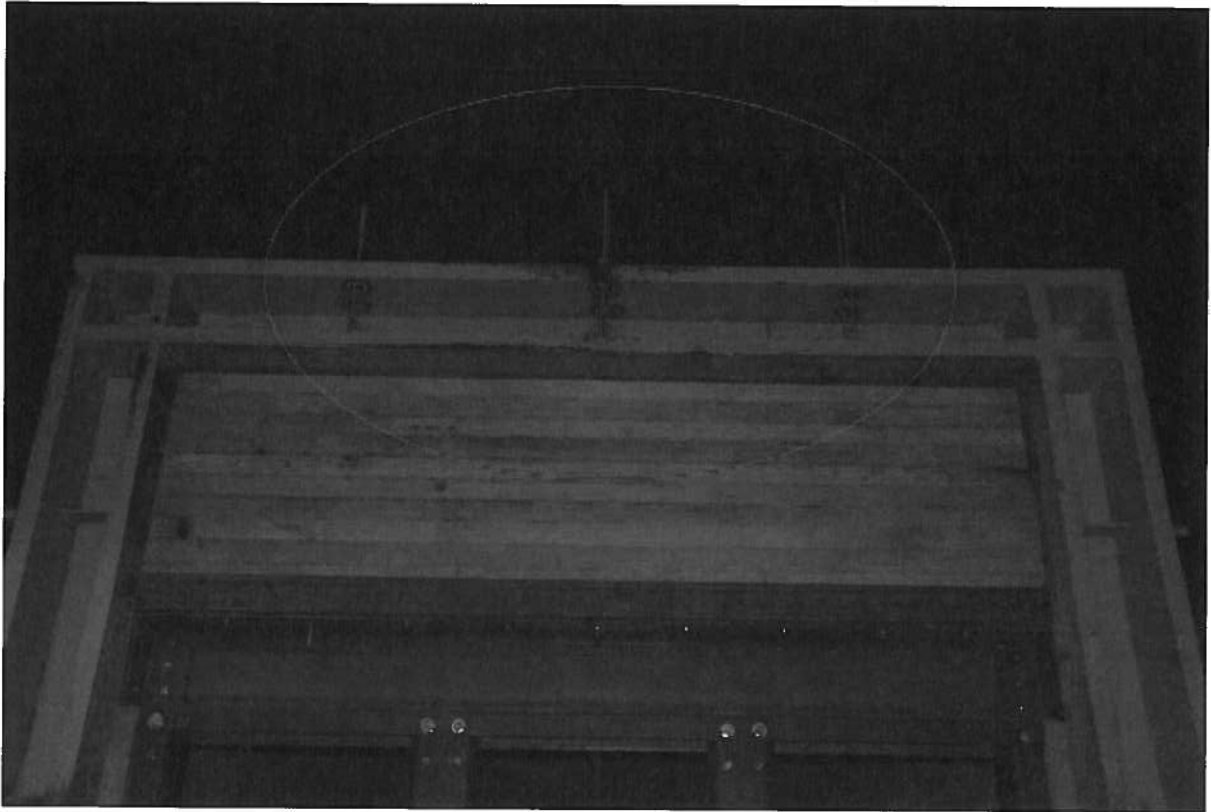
5/8" Threaded Steel Bars Through Boards and I-beam
